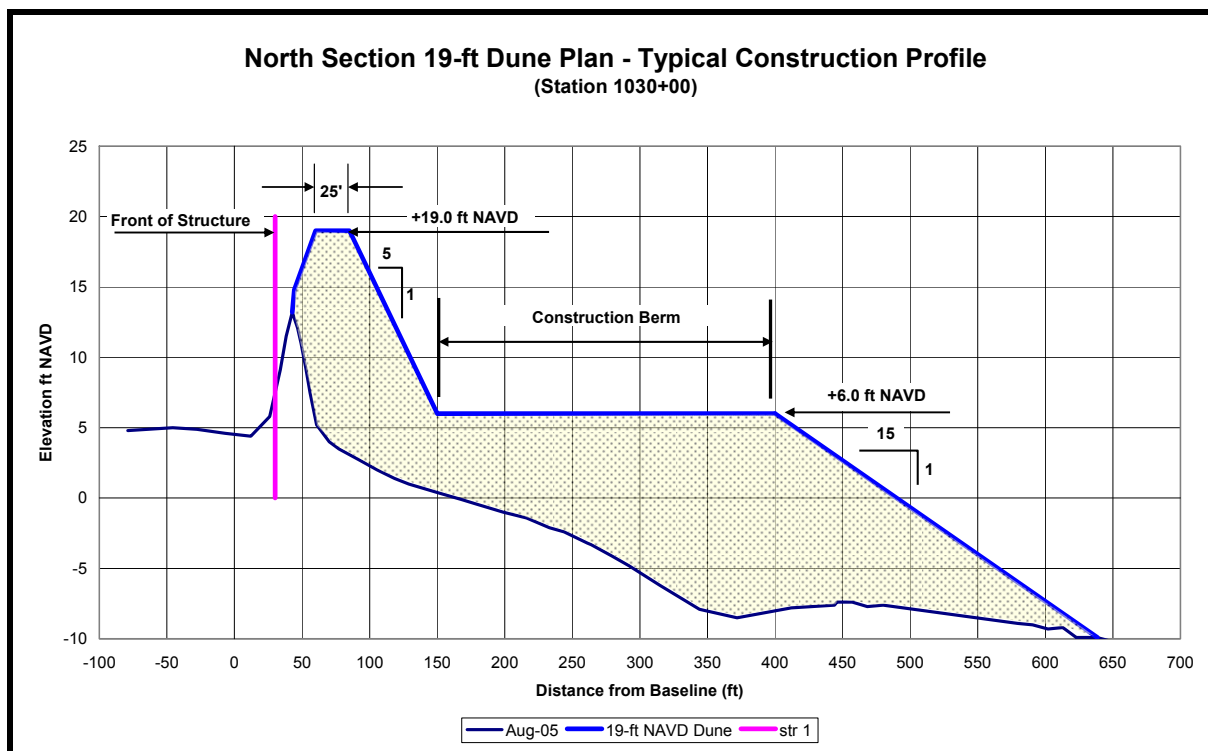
Typical construction profile, North Section 19-foot Dune Plan (Station 1030+00).
